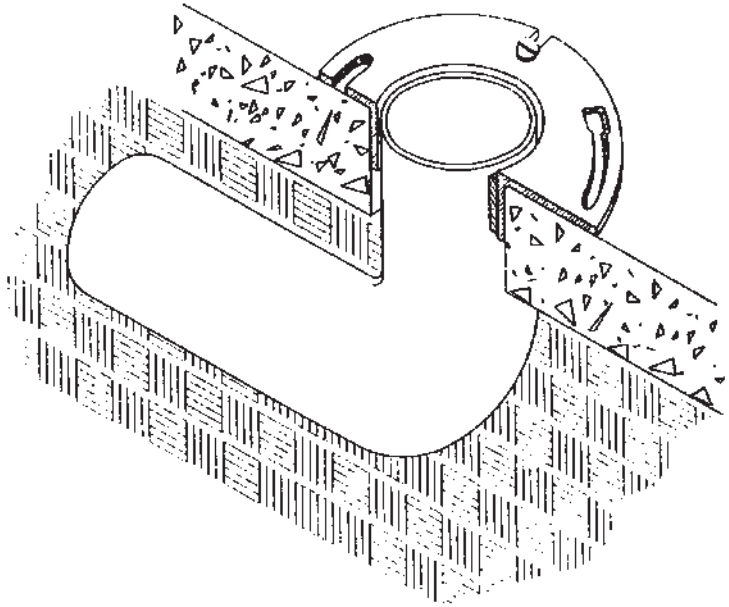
CROSS SECTION VIEW OF CLOSET BEND SHOWING FLANGE PROPERLY SECURED
